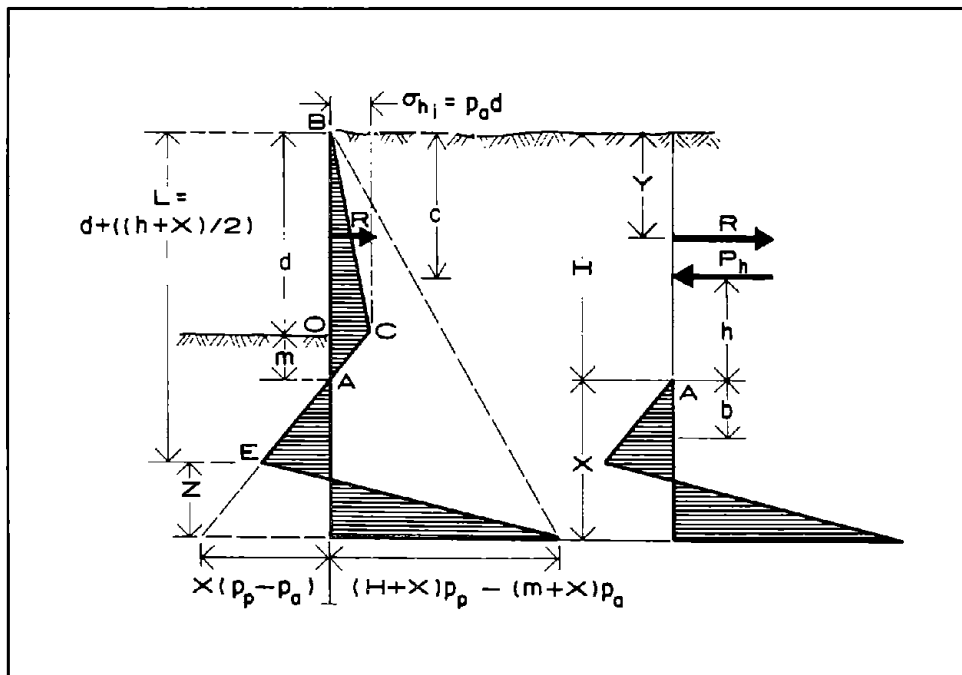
Anchored sheet pile wall—case 2 (earth pressure distribution).
